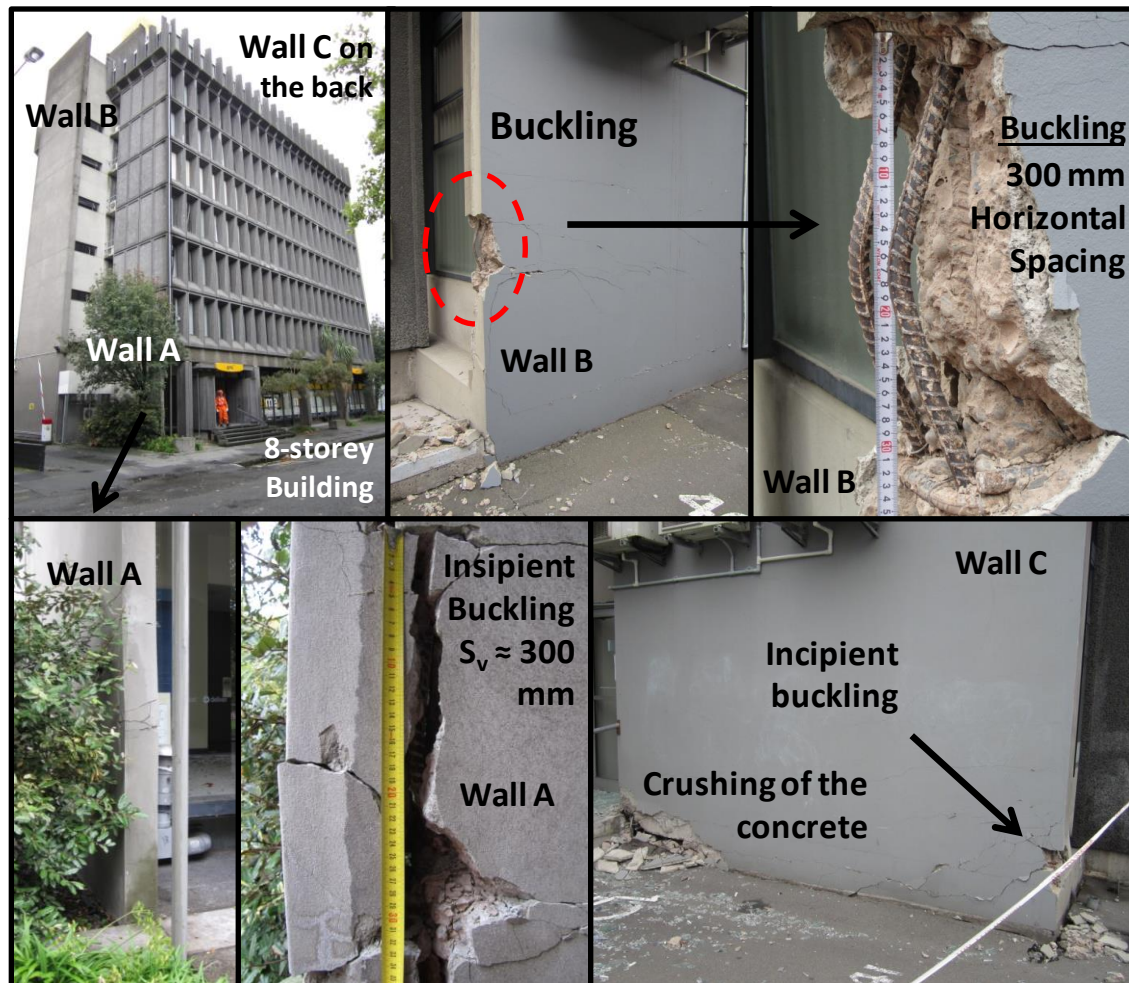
Building 'A' (8 storeys): exterior walls damage; incipient buckling in vertical reinforcement due to large spacing of confinement elements.
